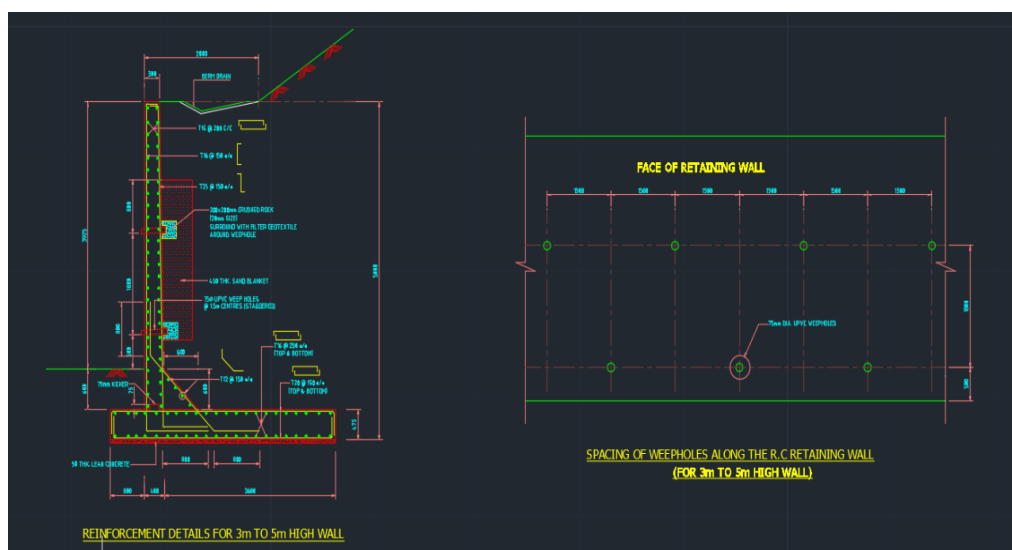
Dimension of the Cantilever Retaining Wall in unit millimetre
